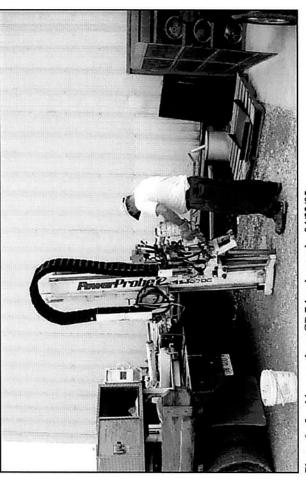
Looking north as GP-7 is advanced. 04/22/05
